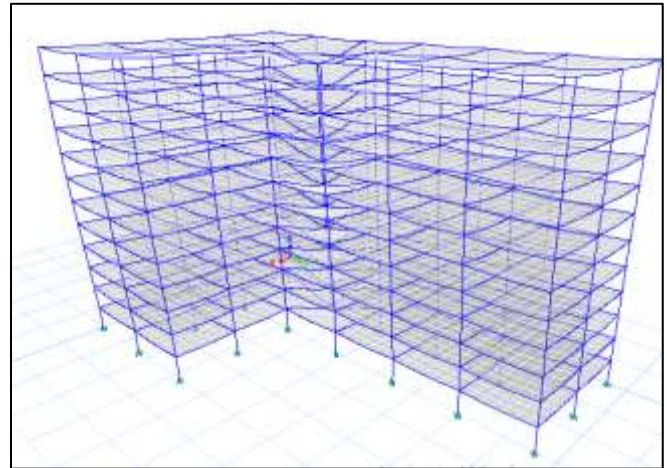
Deformed shape of Structure When Interior column C-10 is lost
